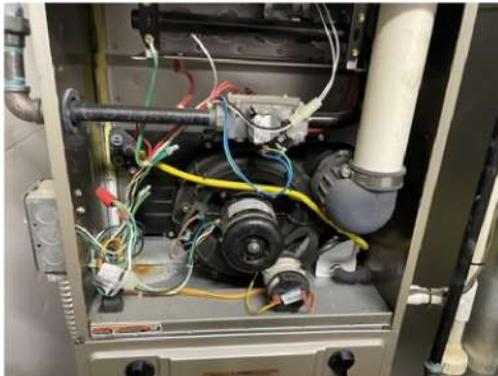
West Addition, SE Mech. Room, Center Furnace, Fiberglass Insulation, Working Furnace, Could not Dismantle
